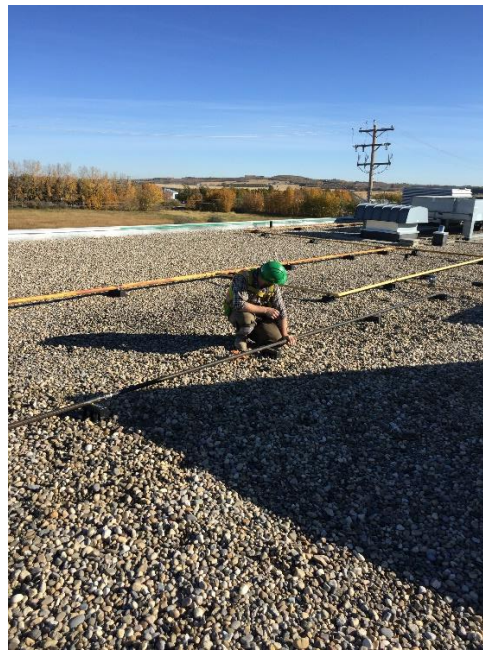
Crouching and kneeling while painting and wrenching pipe during installation.
